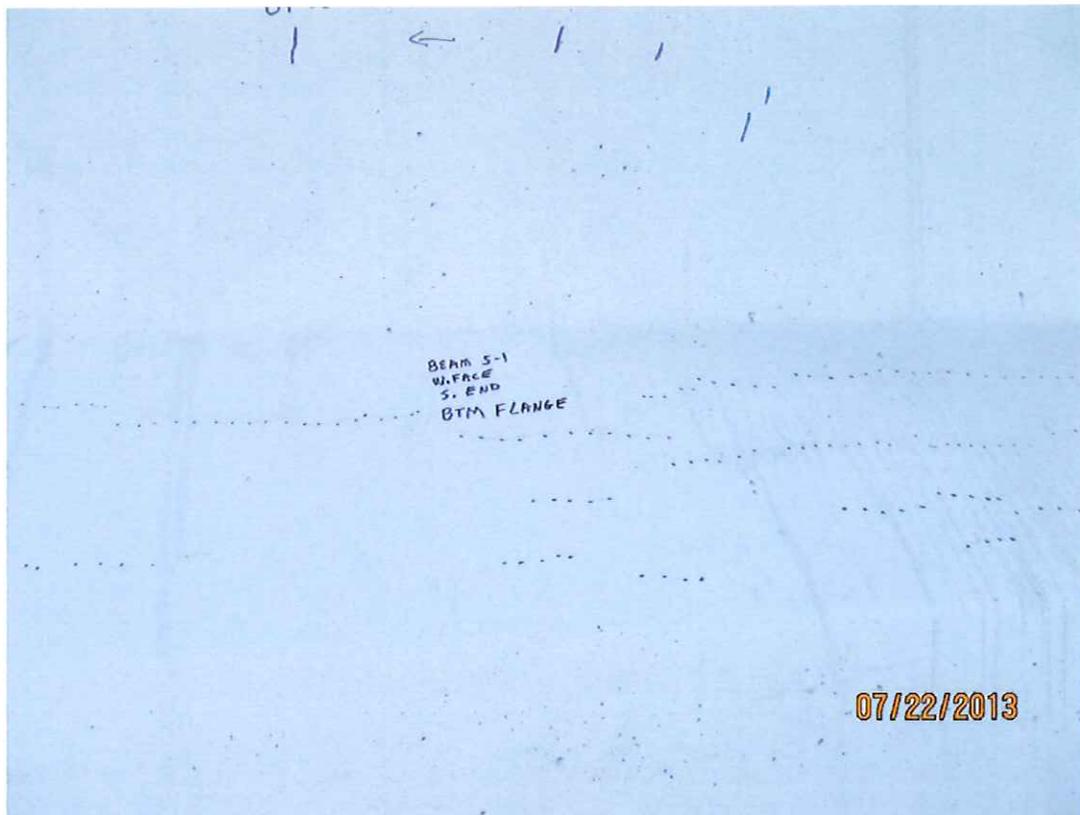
Typical longitudinal cracks in bottom flanges of beams
